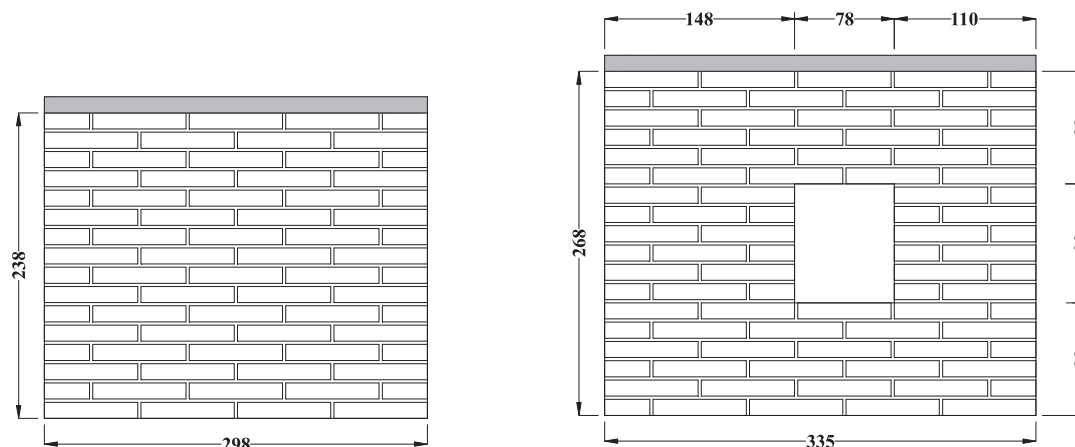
Geometry of tested masonry solid and perforated walls. Dimensions in mm.
